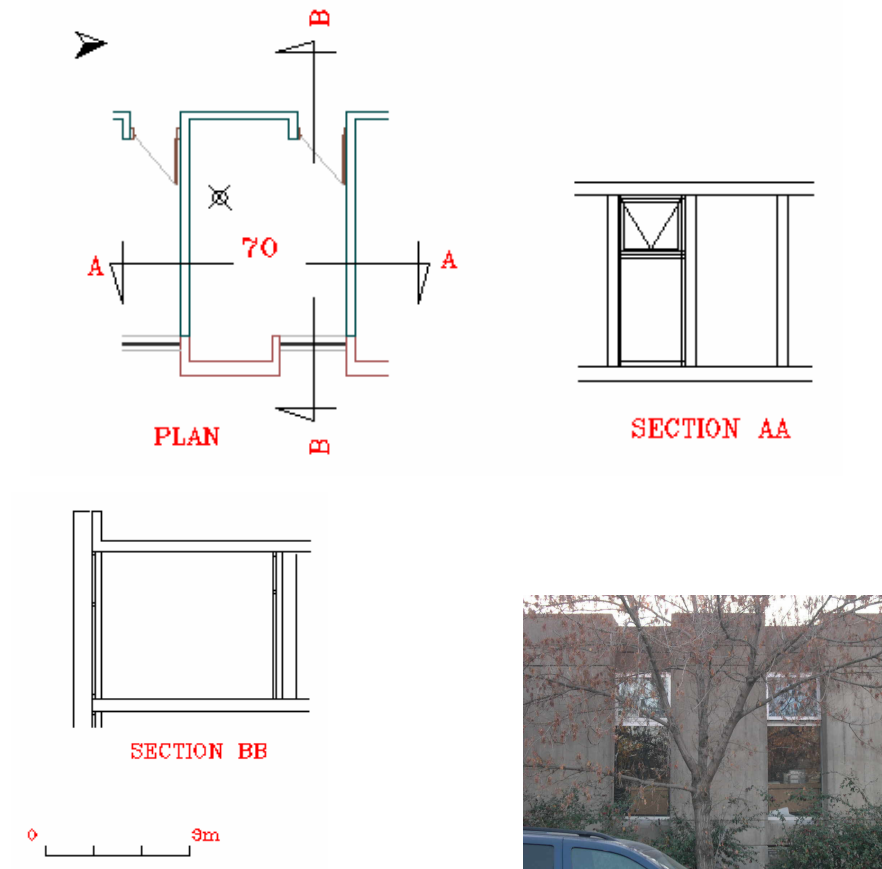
Floor plan, section AA, section BB and exterior view of Room 70. (photo by the author.)
